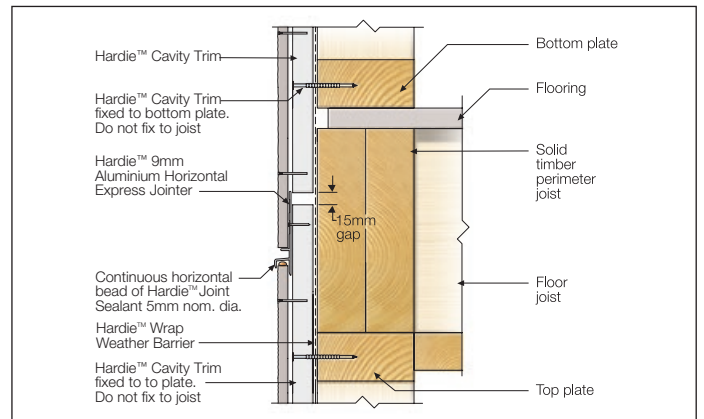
FLOOR LEVEL JUNCTION HORIZONTAL EXPRESS JOINTER
